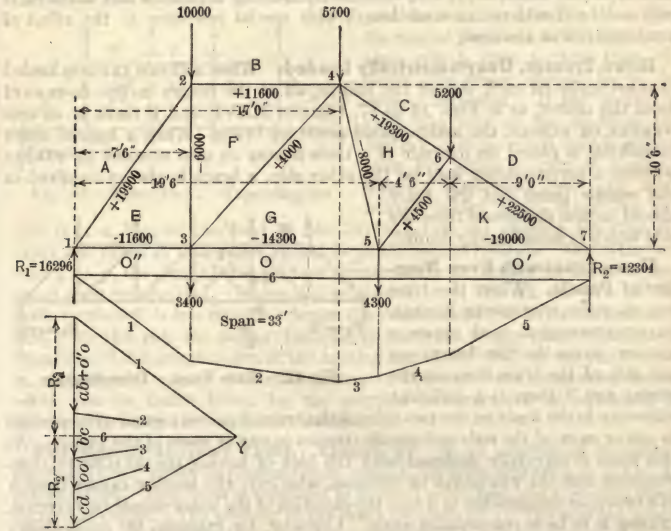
Unsymmetrical Truss. Truss-diagram and Equilibrium-polygon
